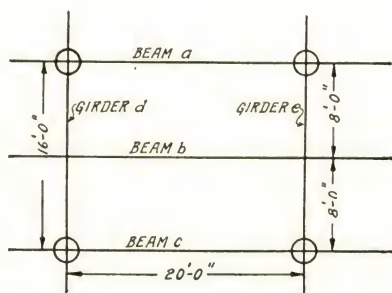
Skeleton Outline of Floor Panel Showing Slab, Beam, and Girder Construction
